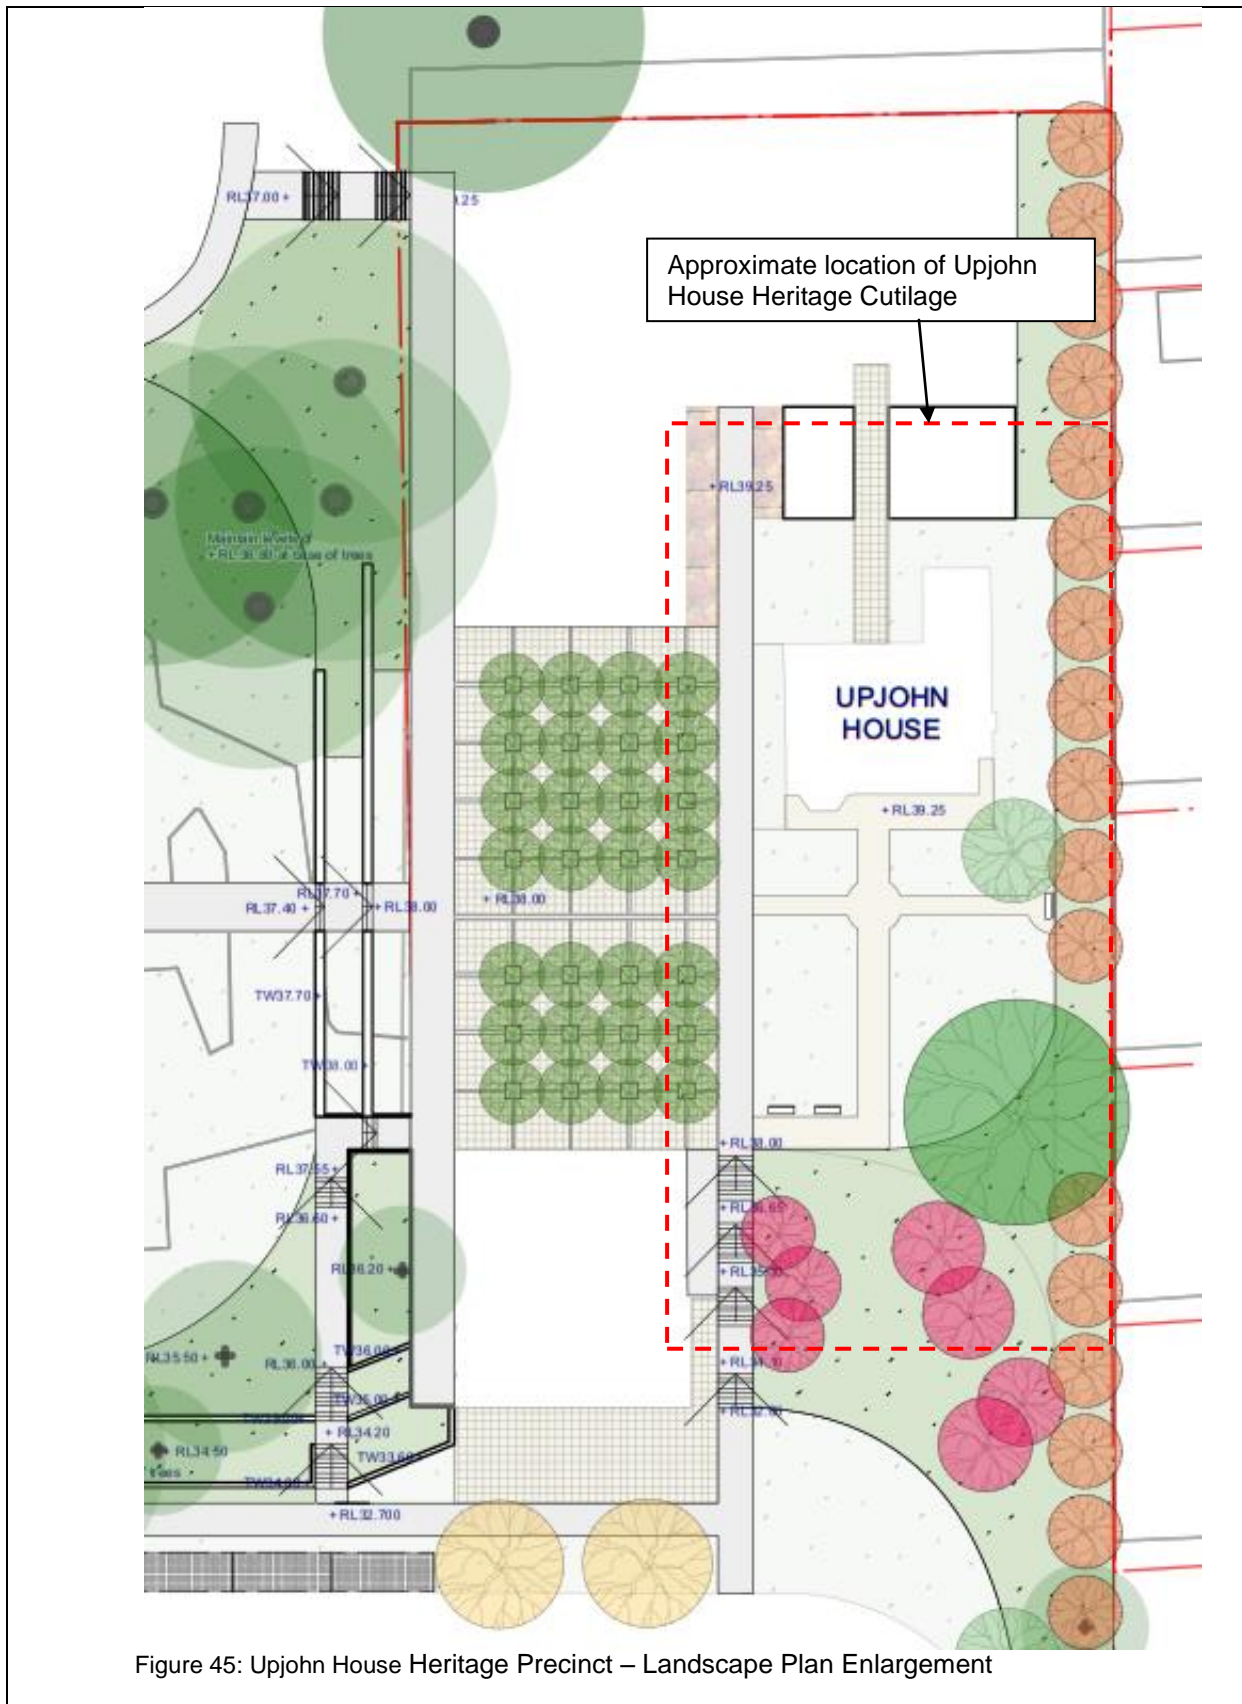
Upjohn House Heritage Precinct – Landscape Plan Enlargement
